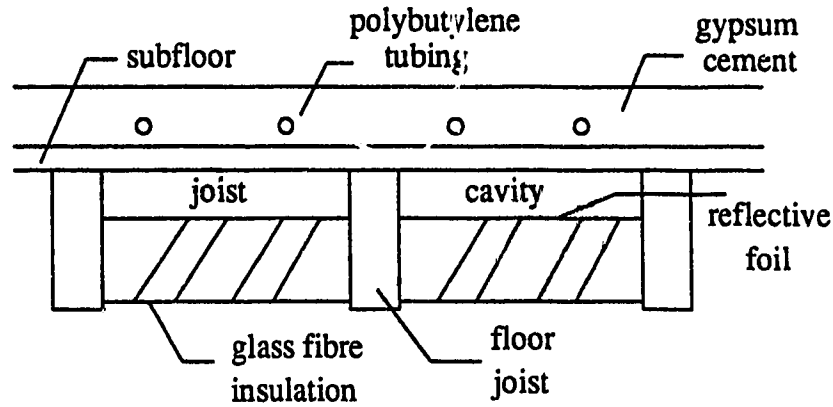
Cross-sectional view of main floor panel and ceiling of the basement
